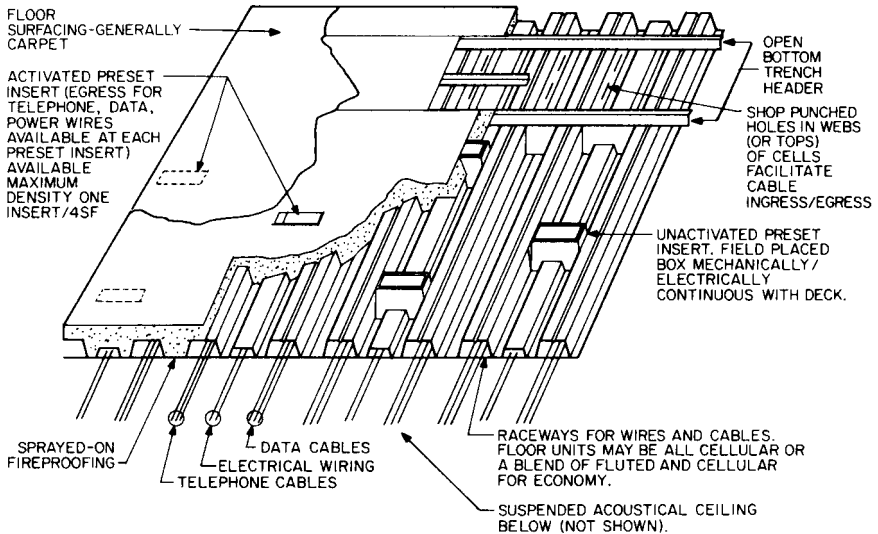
Composite cellular and fluted steel floor sections. (Courtesy H. H. Robertson Co., Ambridge, Pa.)
